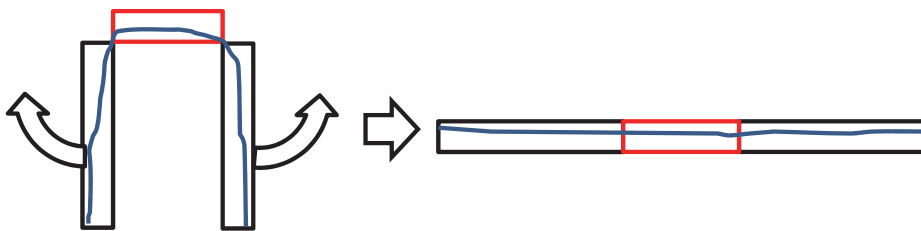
Folding out of tunnel contour for visualisation of tunnel mapping and 2D visualisation of tunnel walls and roof
